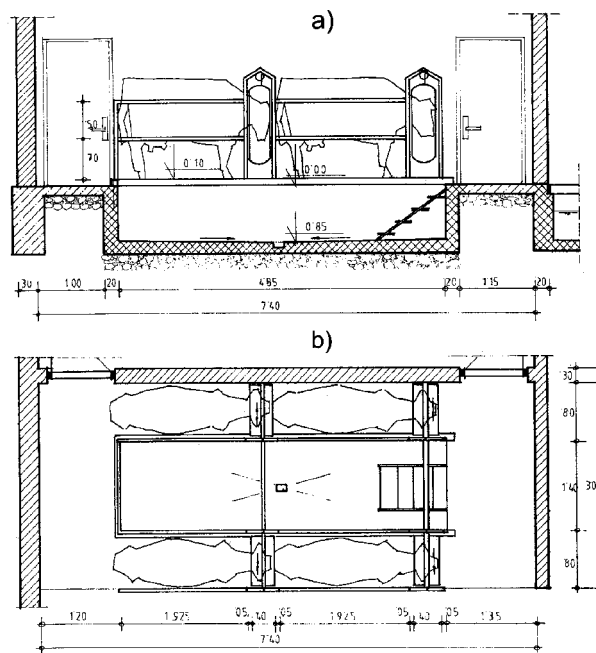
Cross-section (a) and ground plan (b) of milking parlour tandem 2 x 2 [8]
